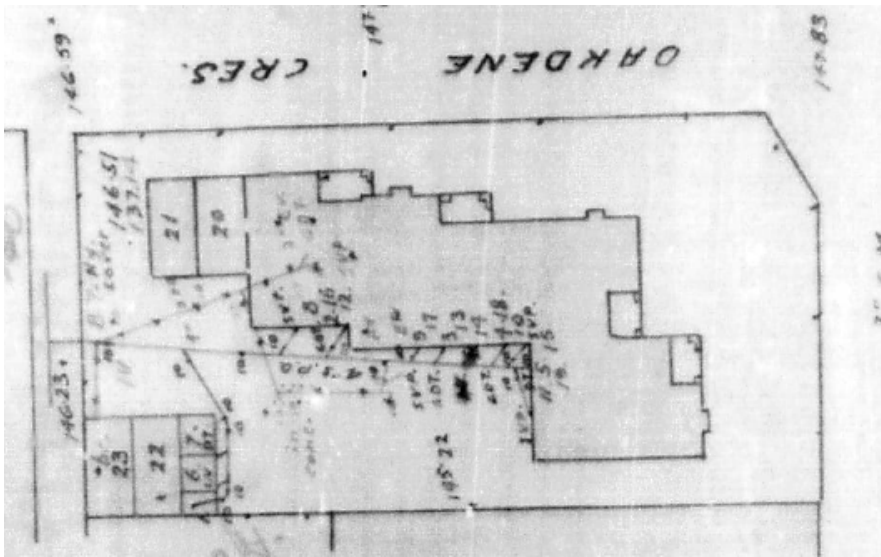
Drainage plan of the subject site dated October 1939, showing a footprint of the block of flats and attached and detached garages, annotated with sewerage works (Source: SEW, Drainage Plan No. 115929)
